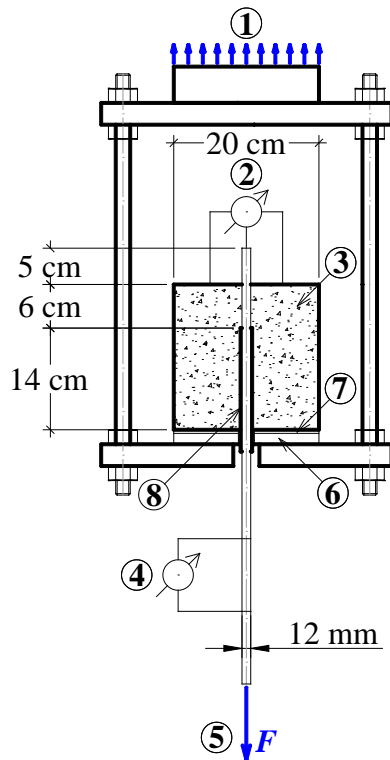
Scheme of pull-out test and specimen dimensions, testing apparatus.
